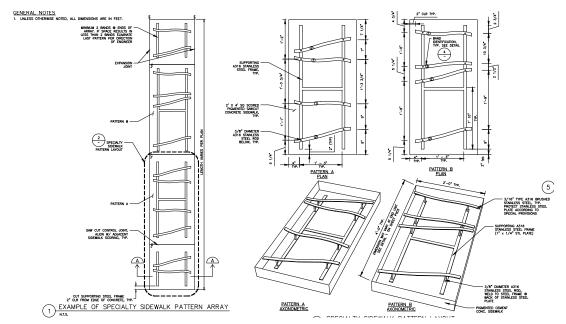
Arterial Street Steel Inlays. See BSP-43 for specific locations where these inlays should be used. Figure 13 further illustrates their desired placement within the sidewalk realm. Inlays should be constructed with A316 Stainless Steel.
